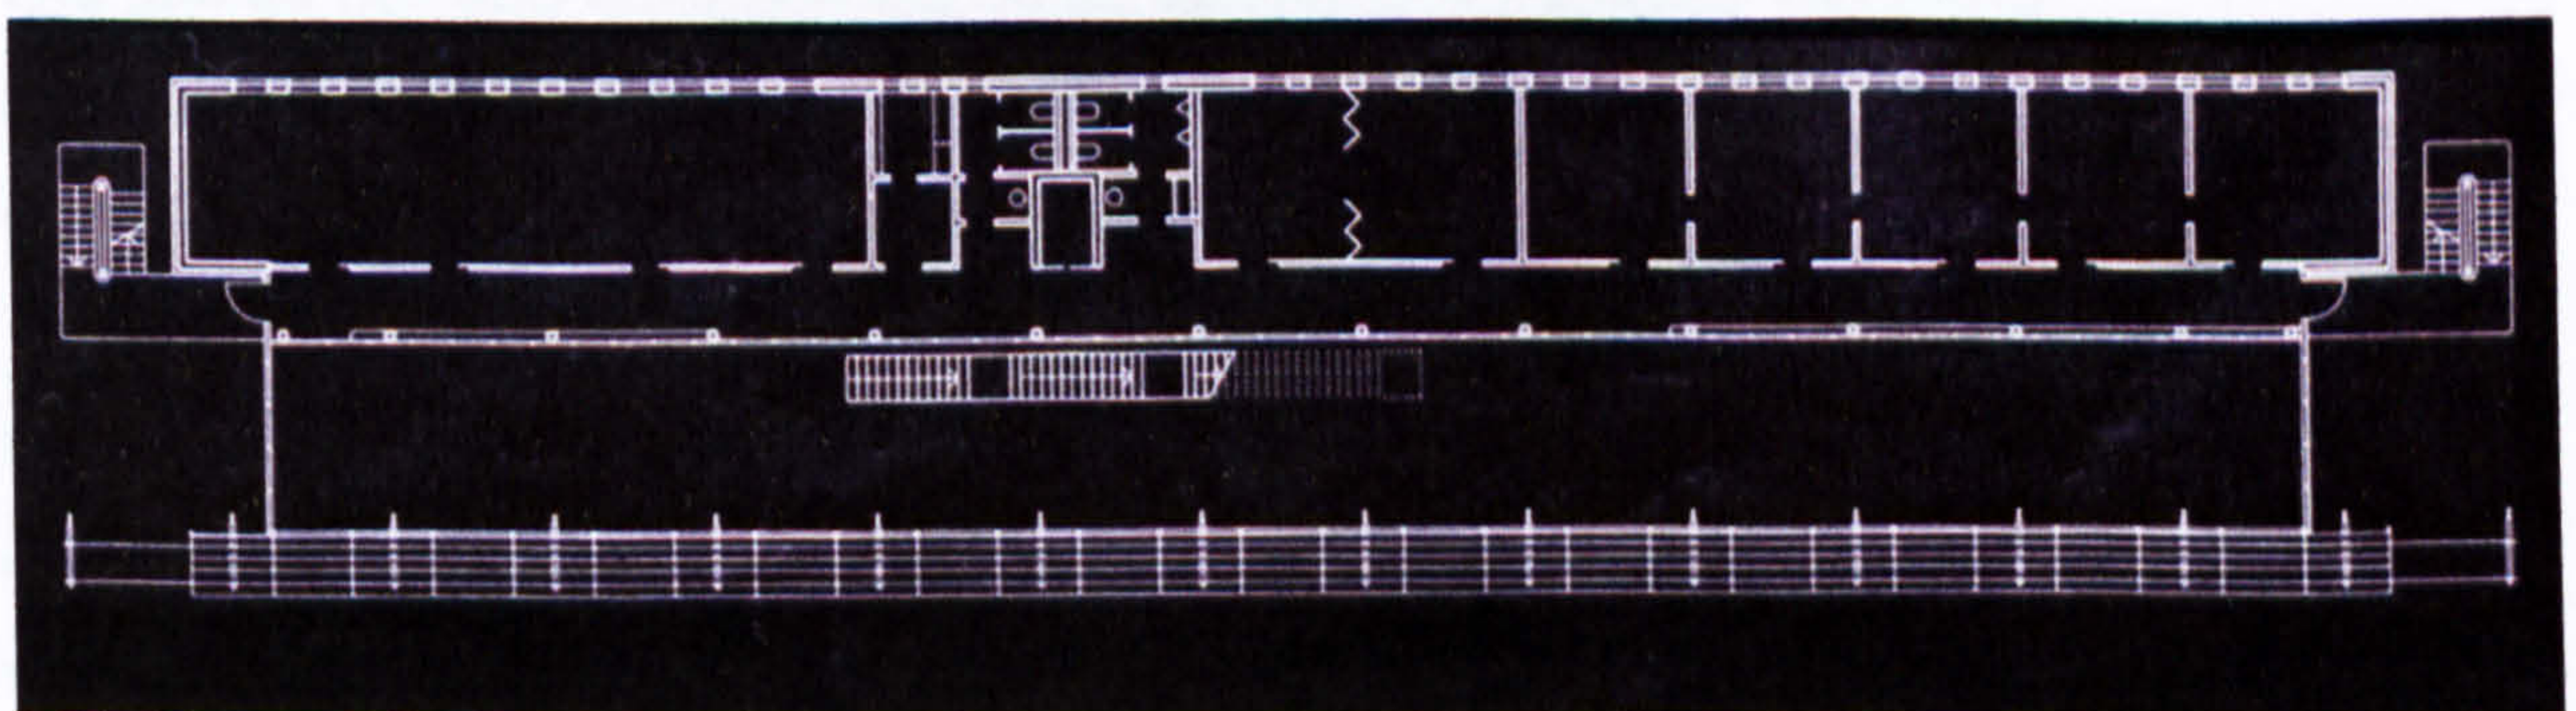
Solar Fabrik building, Freiburg, Germany. First floor plan
